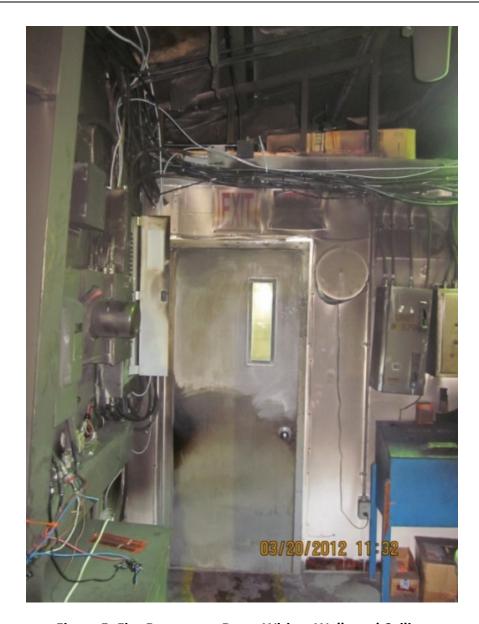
Fire Damage to Door, Wiring, Walls and Ceiling
